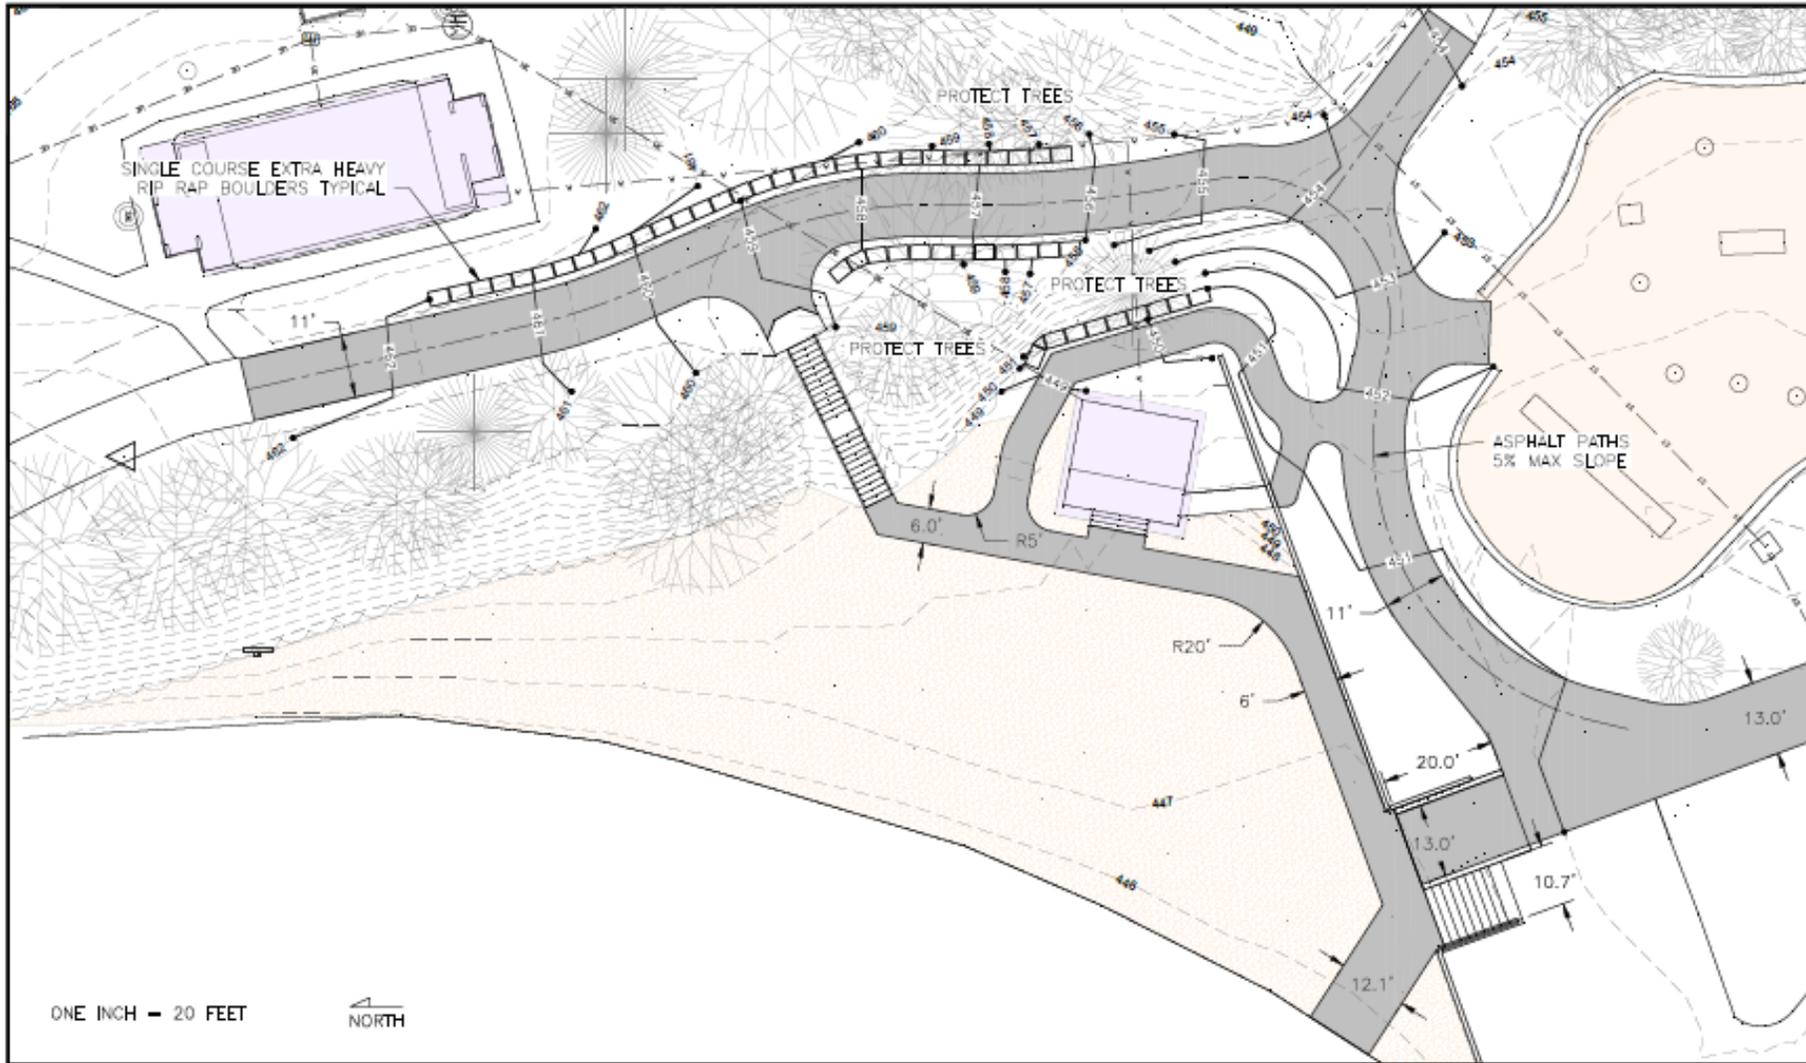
ADA Access Plan at Guarded Swimming Amenity
